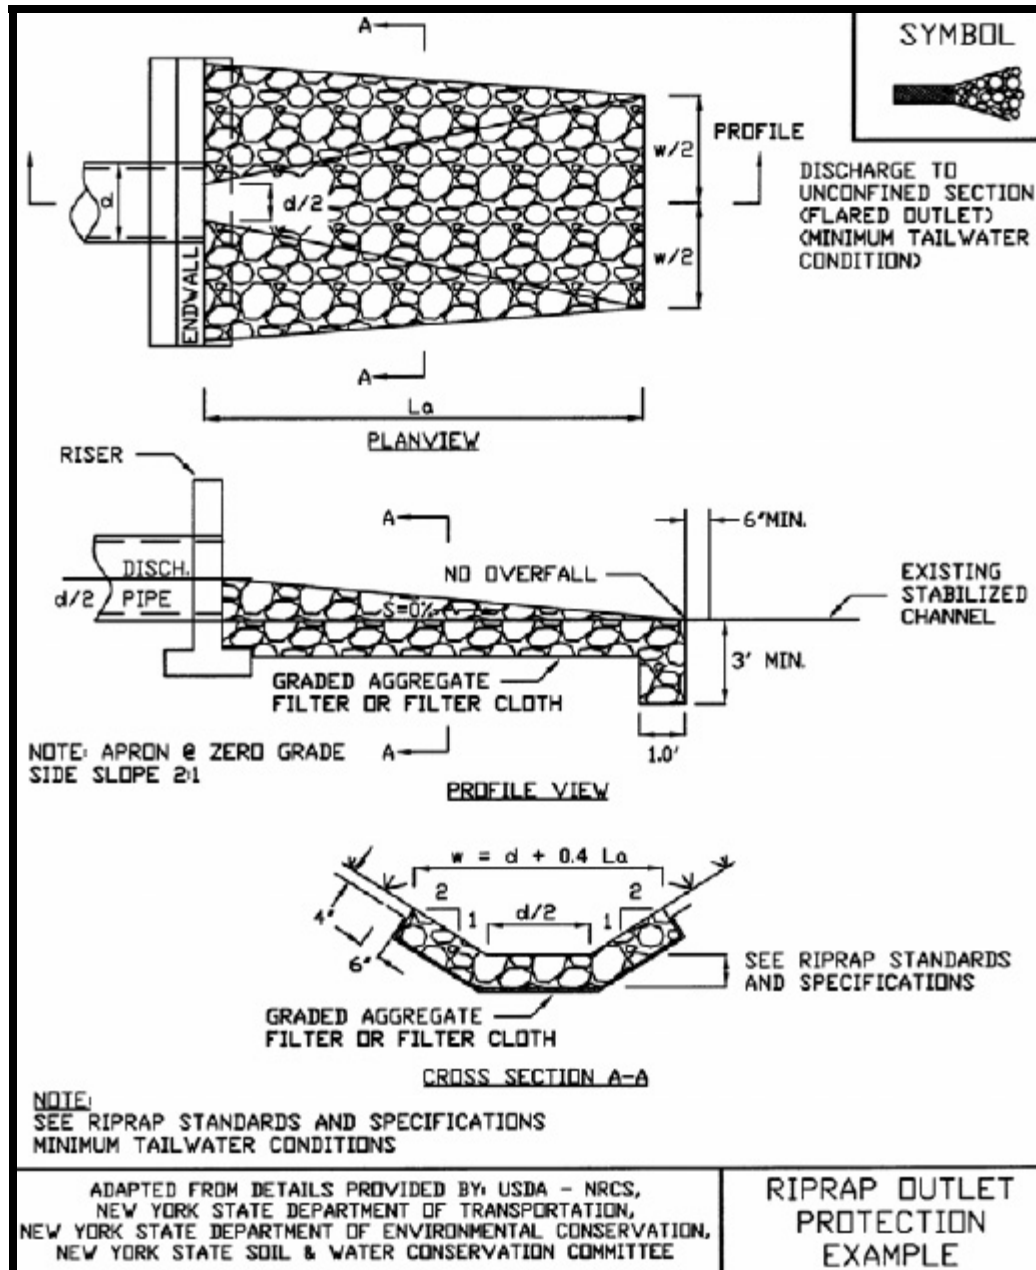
Rock Outlet Protection: Discharge to Unconfined Section
